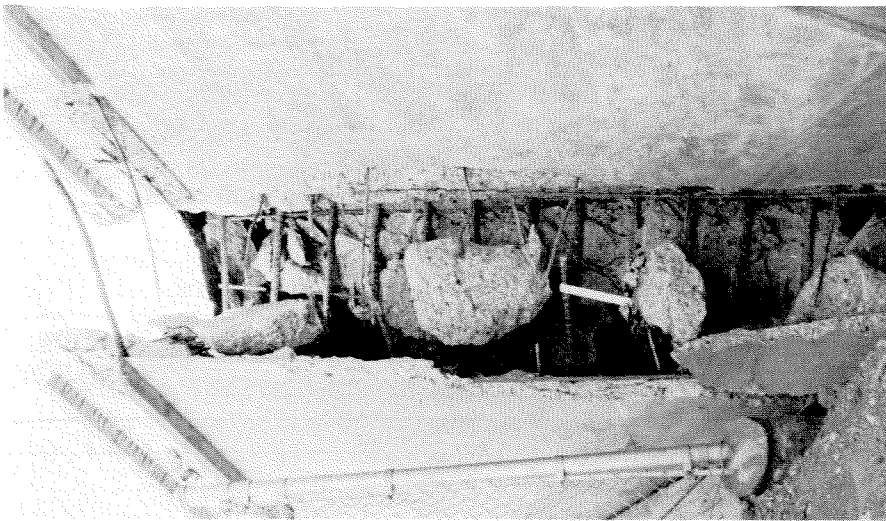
Eastern abutment of the southern bridge of the Roxford Street undercrossing, Foothill freeway.
